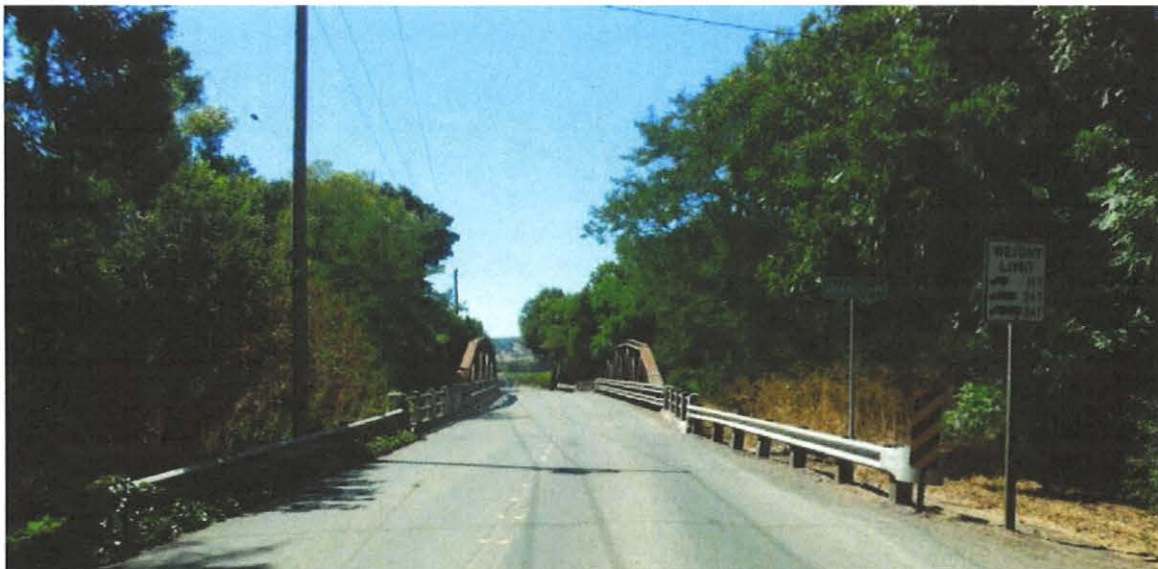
Current condition of bridge and roadway, looking west, DEIR, September 2012.
